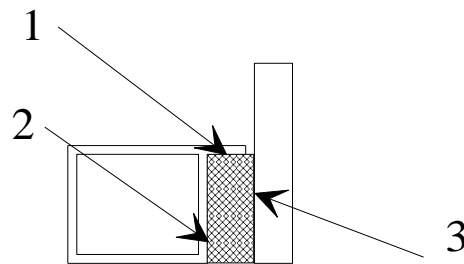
Bonding sealant on three surfaces - not covered by this EAD
